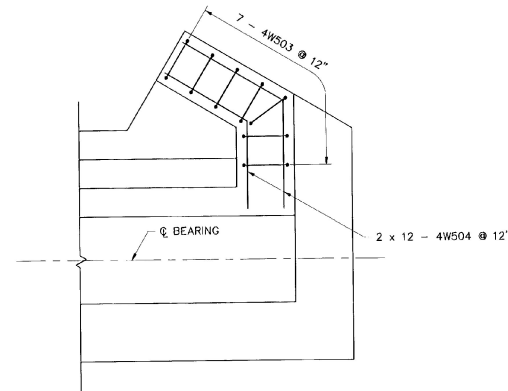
REINFORCING BELOW LEVEL OF BRIDGE SEAT
